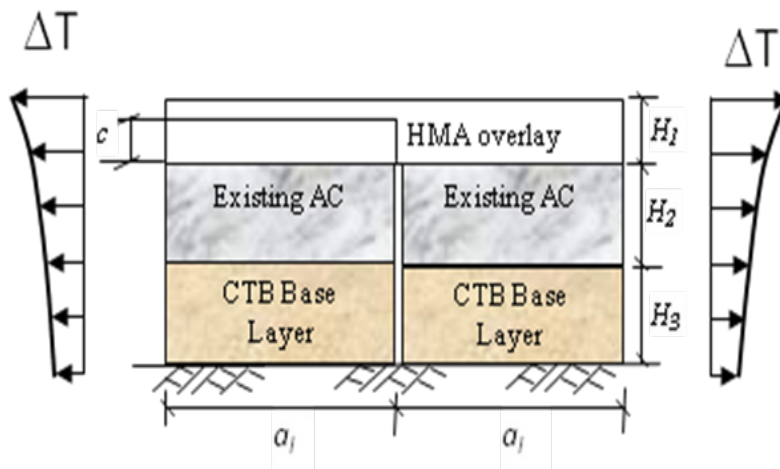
Three-Layer AC/Existing AC/CTB Pavement Structure Thermal SIF Model.
